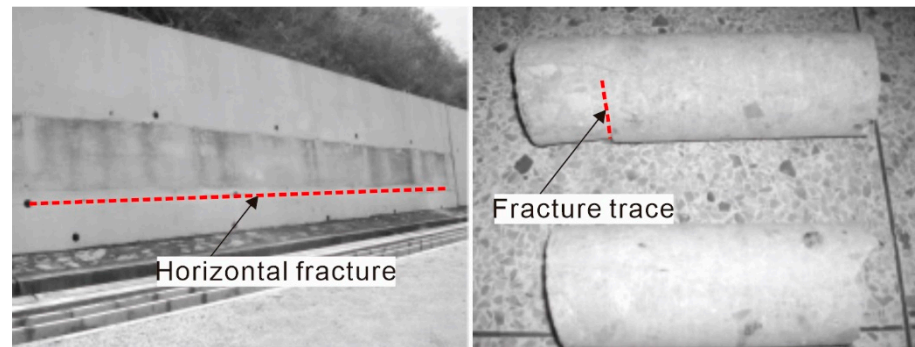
Horizontal fractures and cores of the retaining wall.
